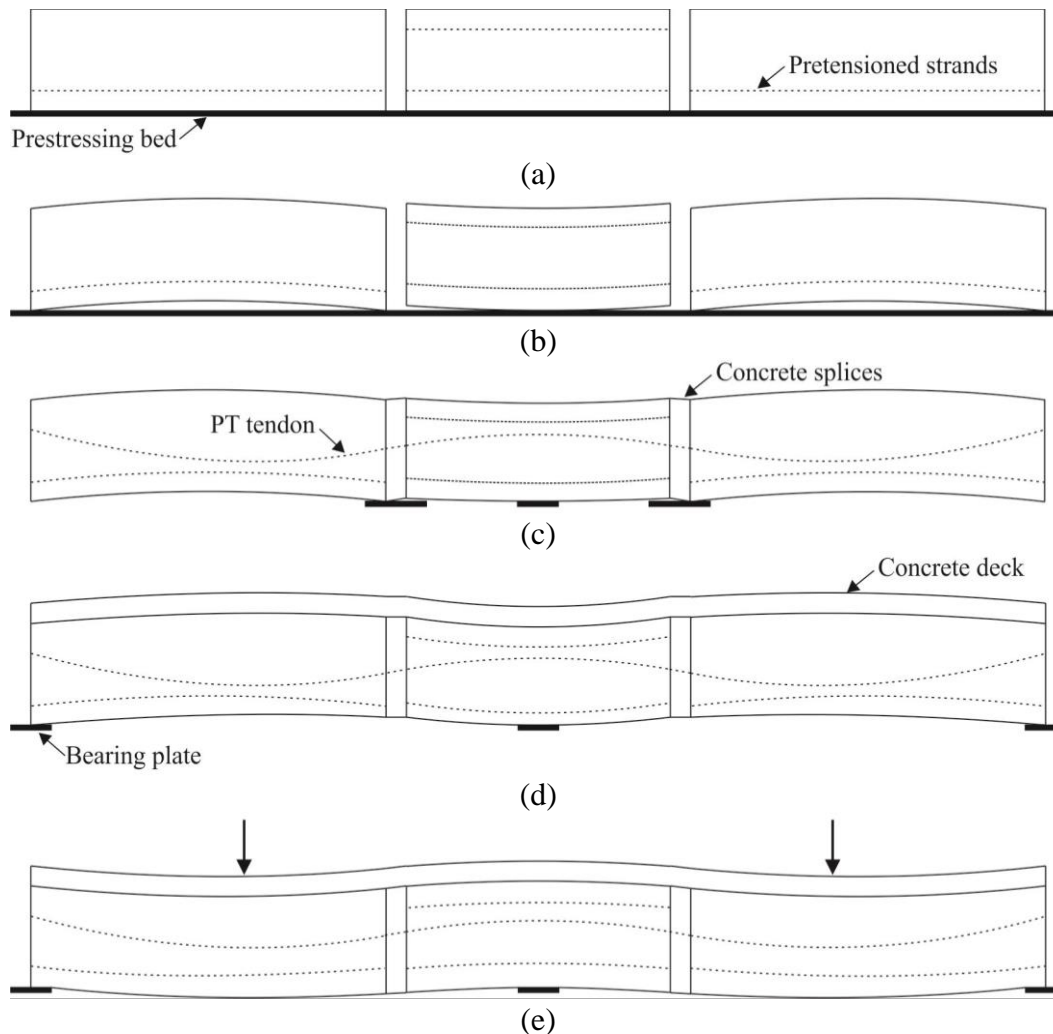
Construction stages for negative bending beams: (a) application of gravity to beam segments placed over prestressing bed, (b) pretensioning, (c) addition of splices and post-tensioning, (d) addition of concrete deck and post-tensioning, (e) external loads
